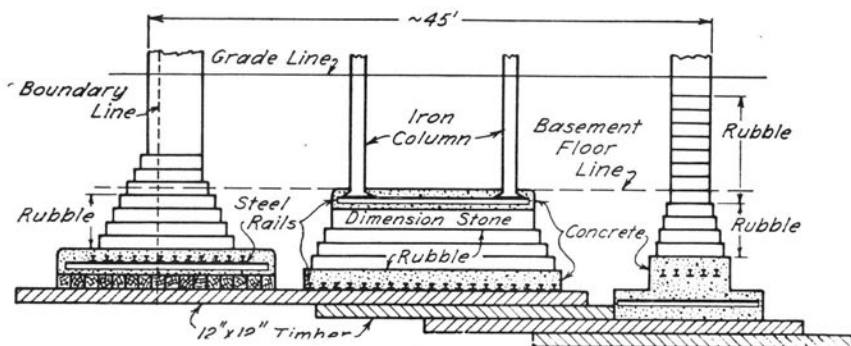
SECTION THROUGH COMBINED FOOTINGS OF AUDITORIUM
